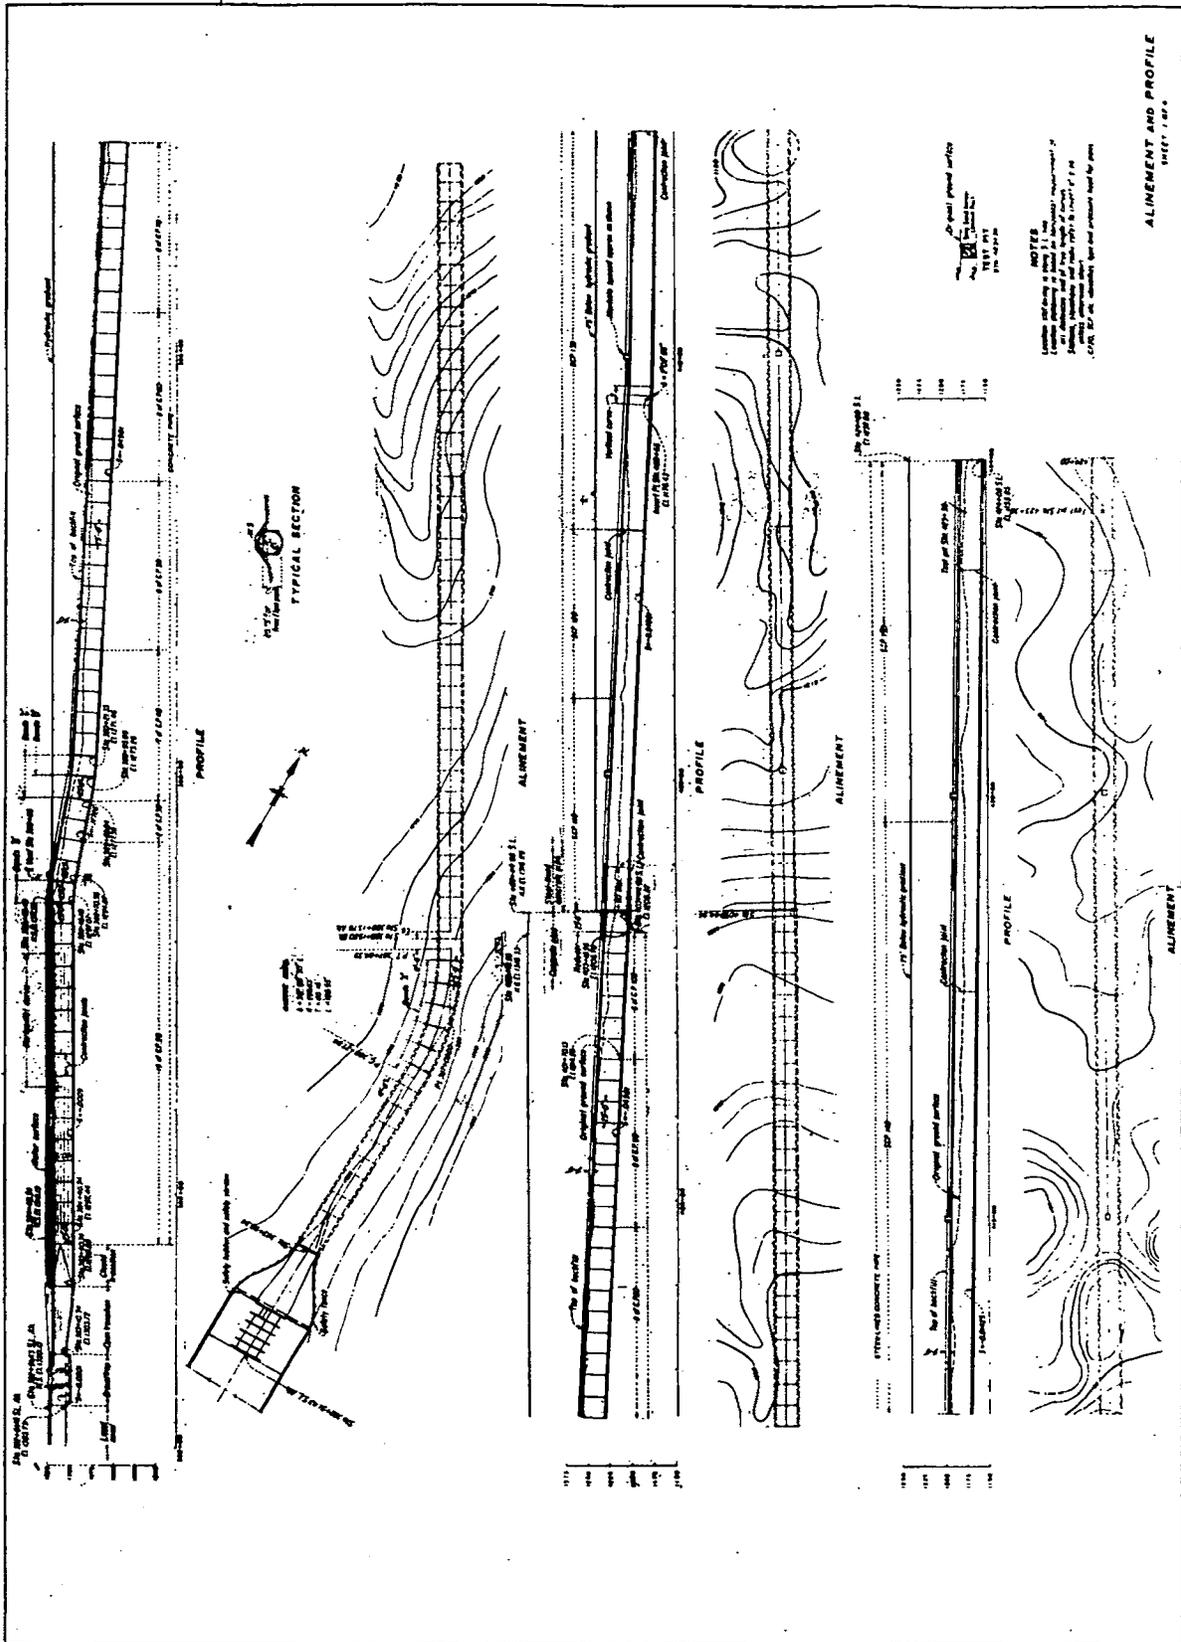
Alignment and profile of the steel-lined concrete pipe (Sheet 1).
